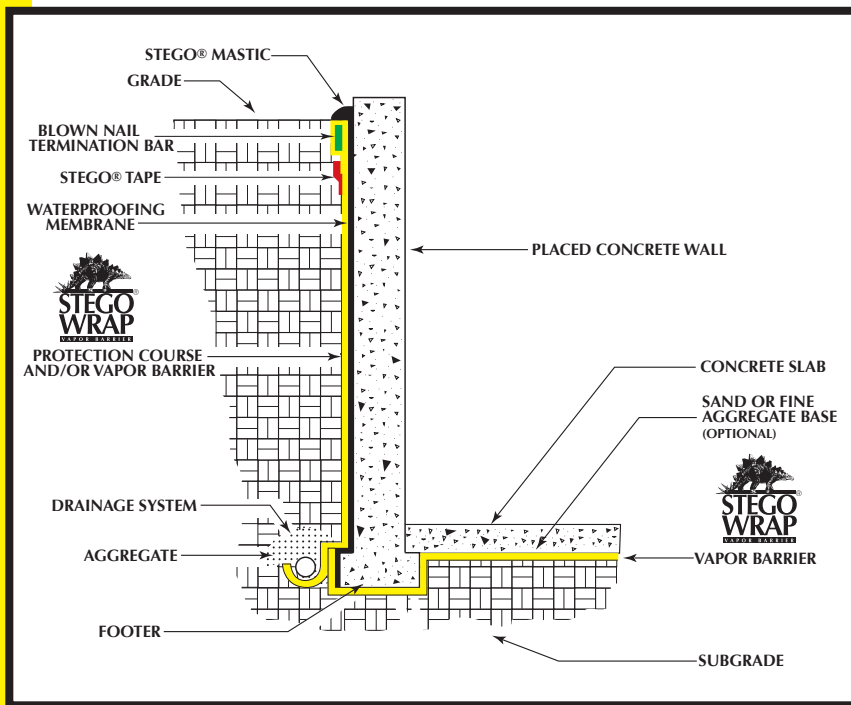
OPTIONAL INSTALLATION FOR FOOTING ENCAPSULATION AND WATERPROOFING TIE-IN
